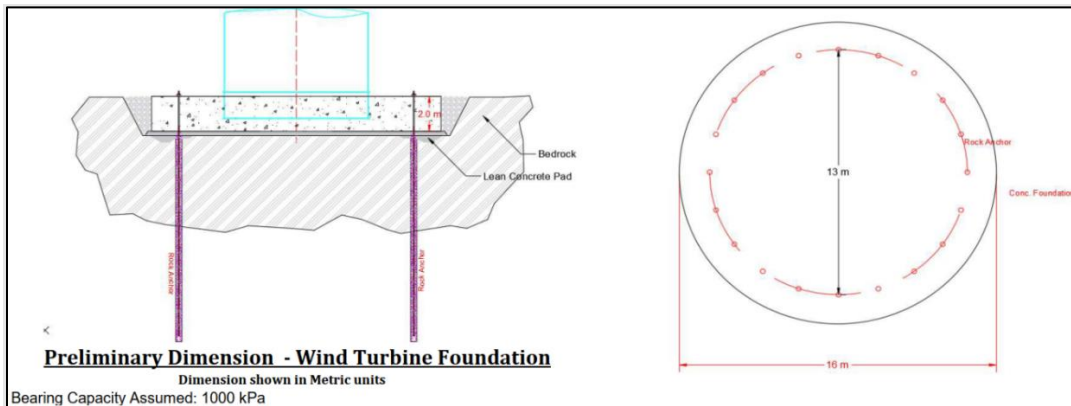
Turbine Rock Anchor Foundation Schematic
